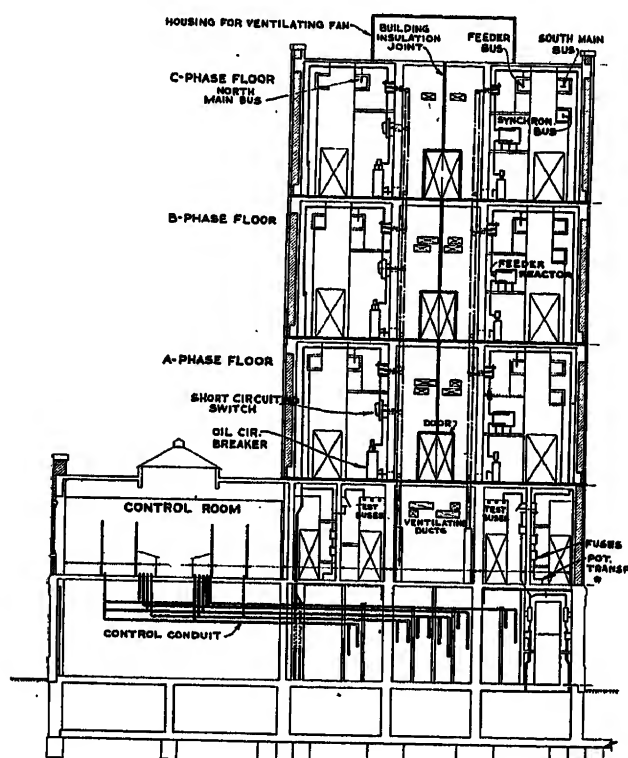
SIDE VIEW OF SWITCH HOUSE APPARATUS
